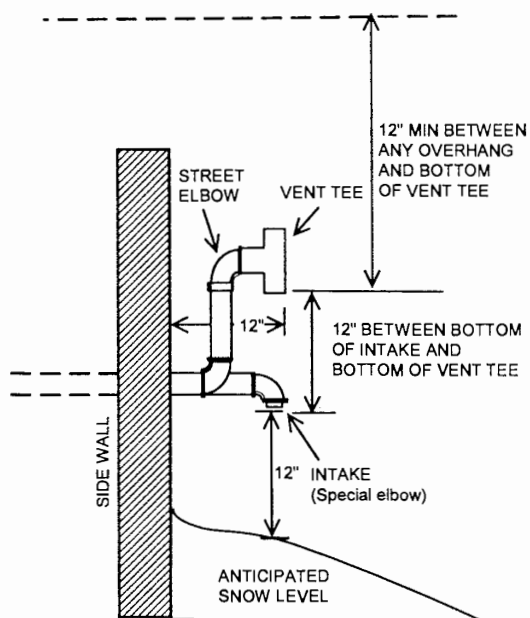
TYPICAL SIDEWALL TERMINATION
